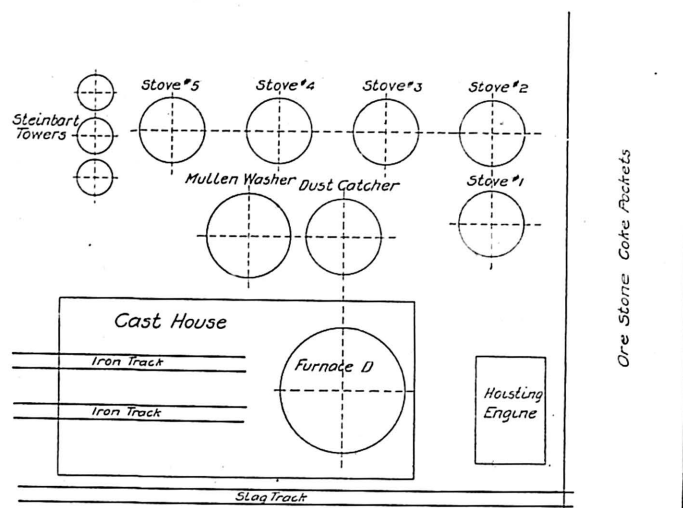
GENERAL PLAN OF BLAST FURNACE PLANT.
